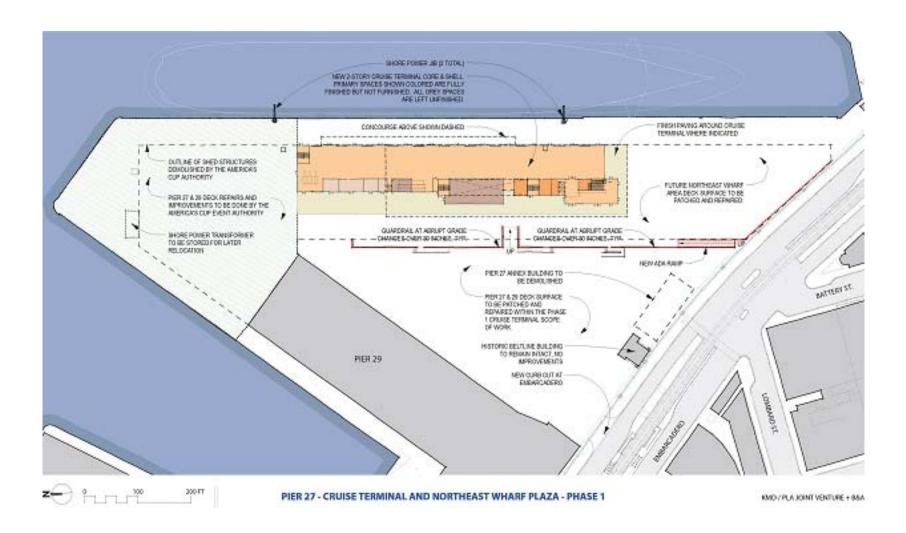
Proposed Pier 27 Cruise Terminal and Northeast Wharf Plaza - Phase I Source: KMD/PLA Joint Venture + B&A, February 2011
